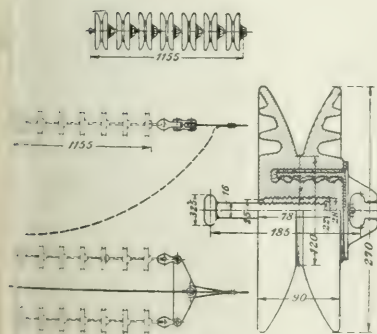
Strain Insulator Used at Crossing of River Elbe.
